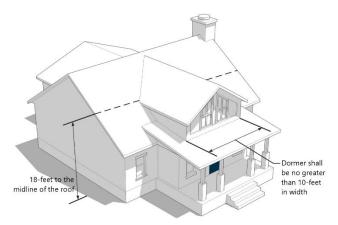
Example of a Second Story Contained Within a Pitched Roofline with Front and/or Rear Dormers
